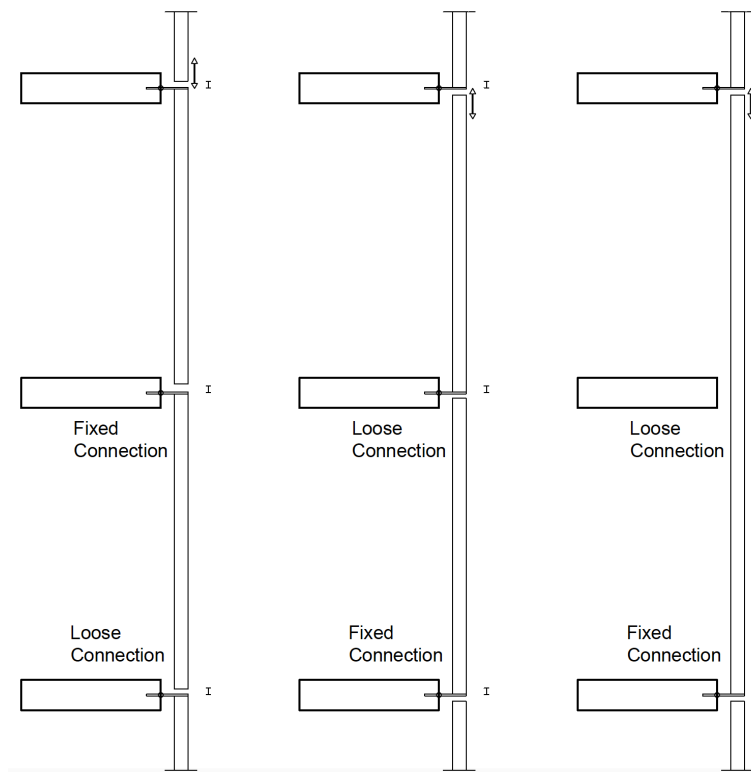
Façade bearing systems: a suspended structure on the left, a single-storey supported structure in the centre and a two-storey supported structure on the right. Source: Knaack, U. et al. (2014). *Façades. Principles of Construction
